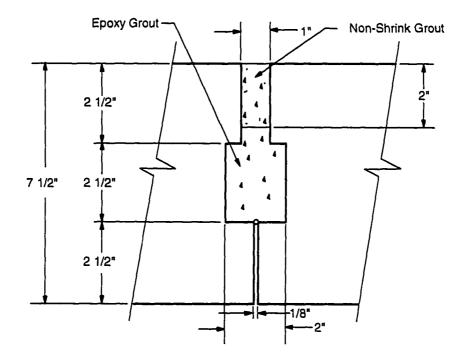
Connection details, Bridge No. 6, NYSDOT.
